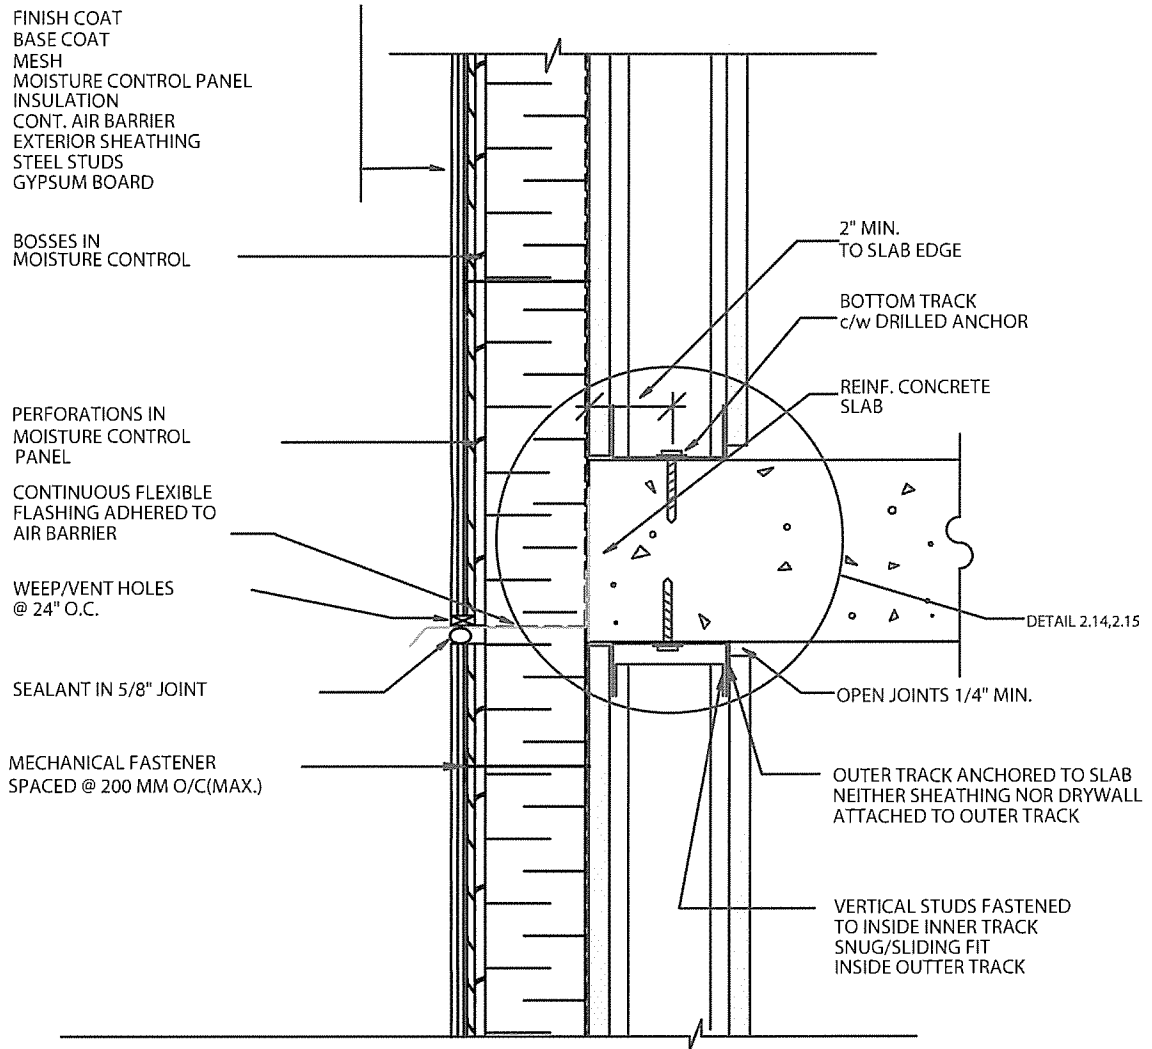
ACRYLIC STUCCO/ STEEL STUD
